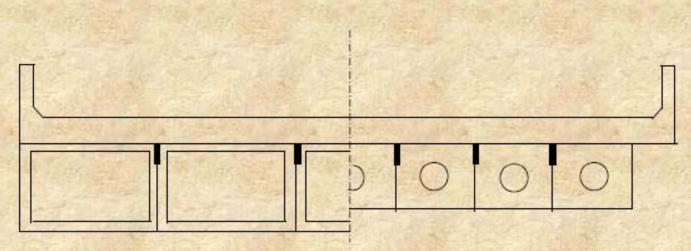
Cast-In-Place Concrete Slab over Precast Solid, Voided or Cellular Boxes with Shear Keys.
